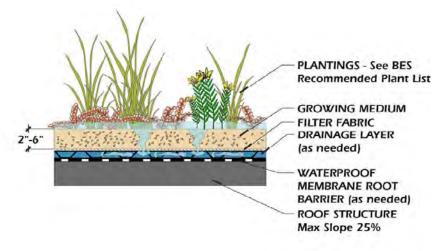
Extensive Green Roof System (Source: City of Portland, OR, 2004)
